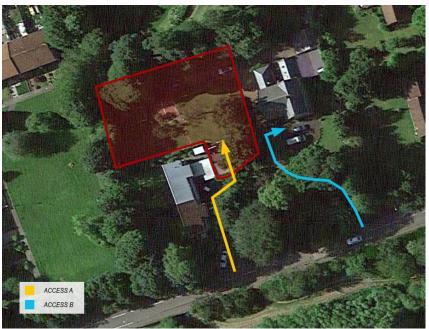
Proposed access diagram. Access A for the proposed development and access B for the existing Birchwood House.
